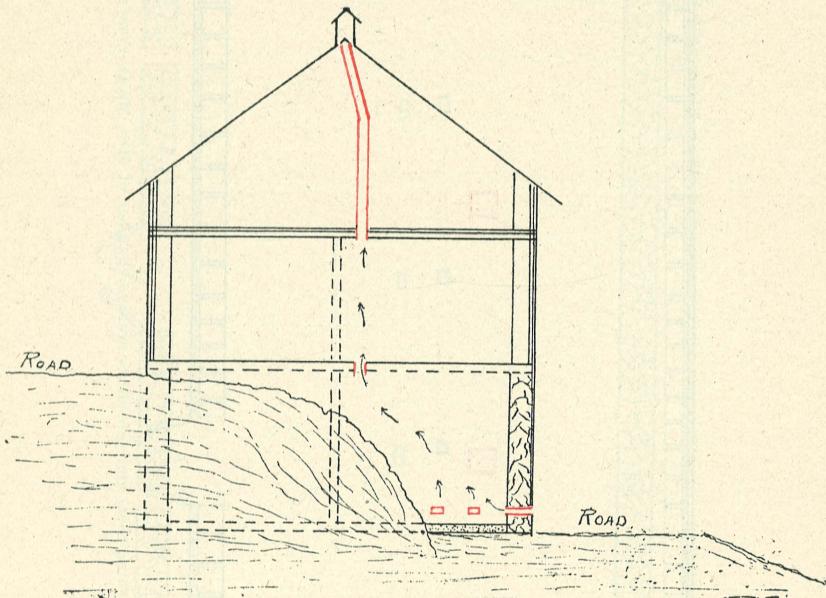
Cross-section of Mrs. Cone's apple house, showing position in hill and ventilating system.
